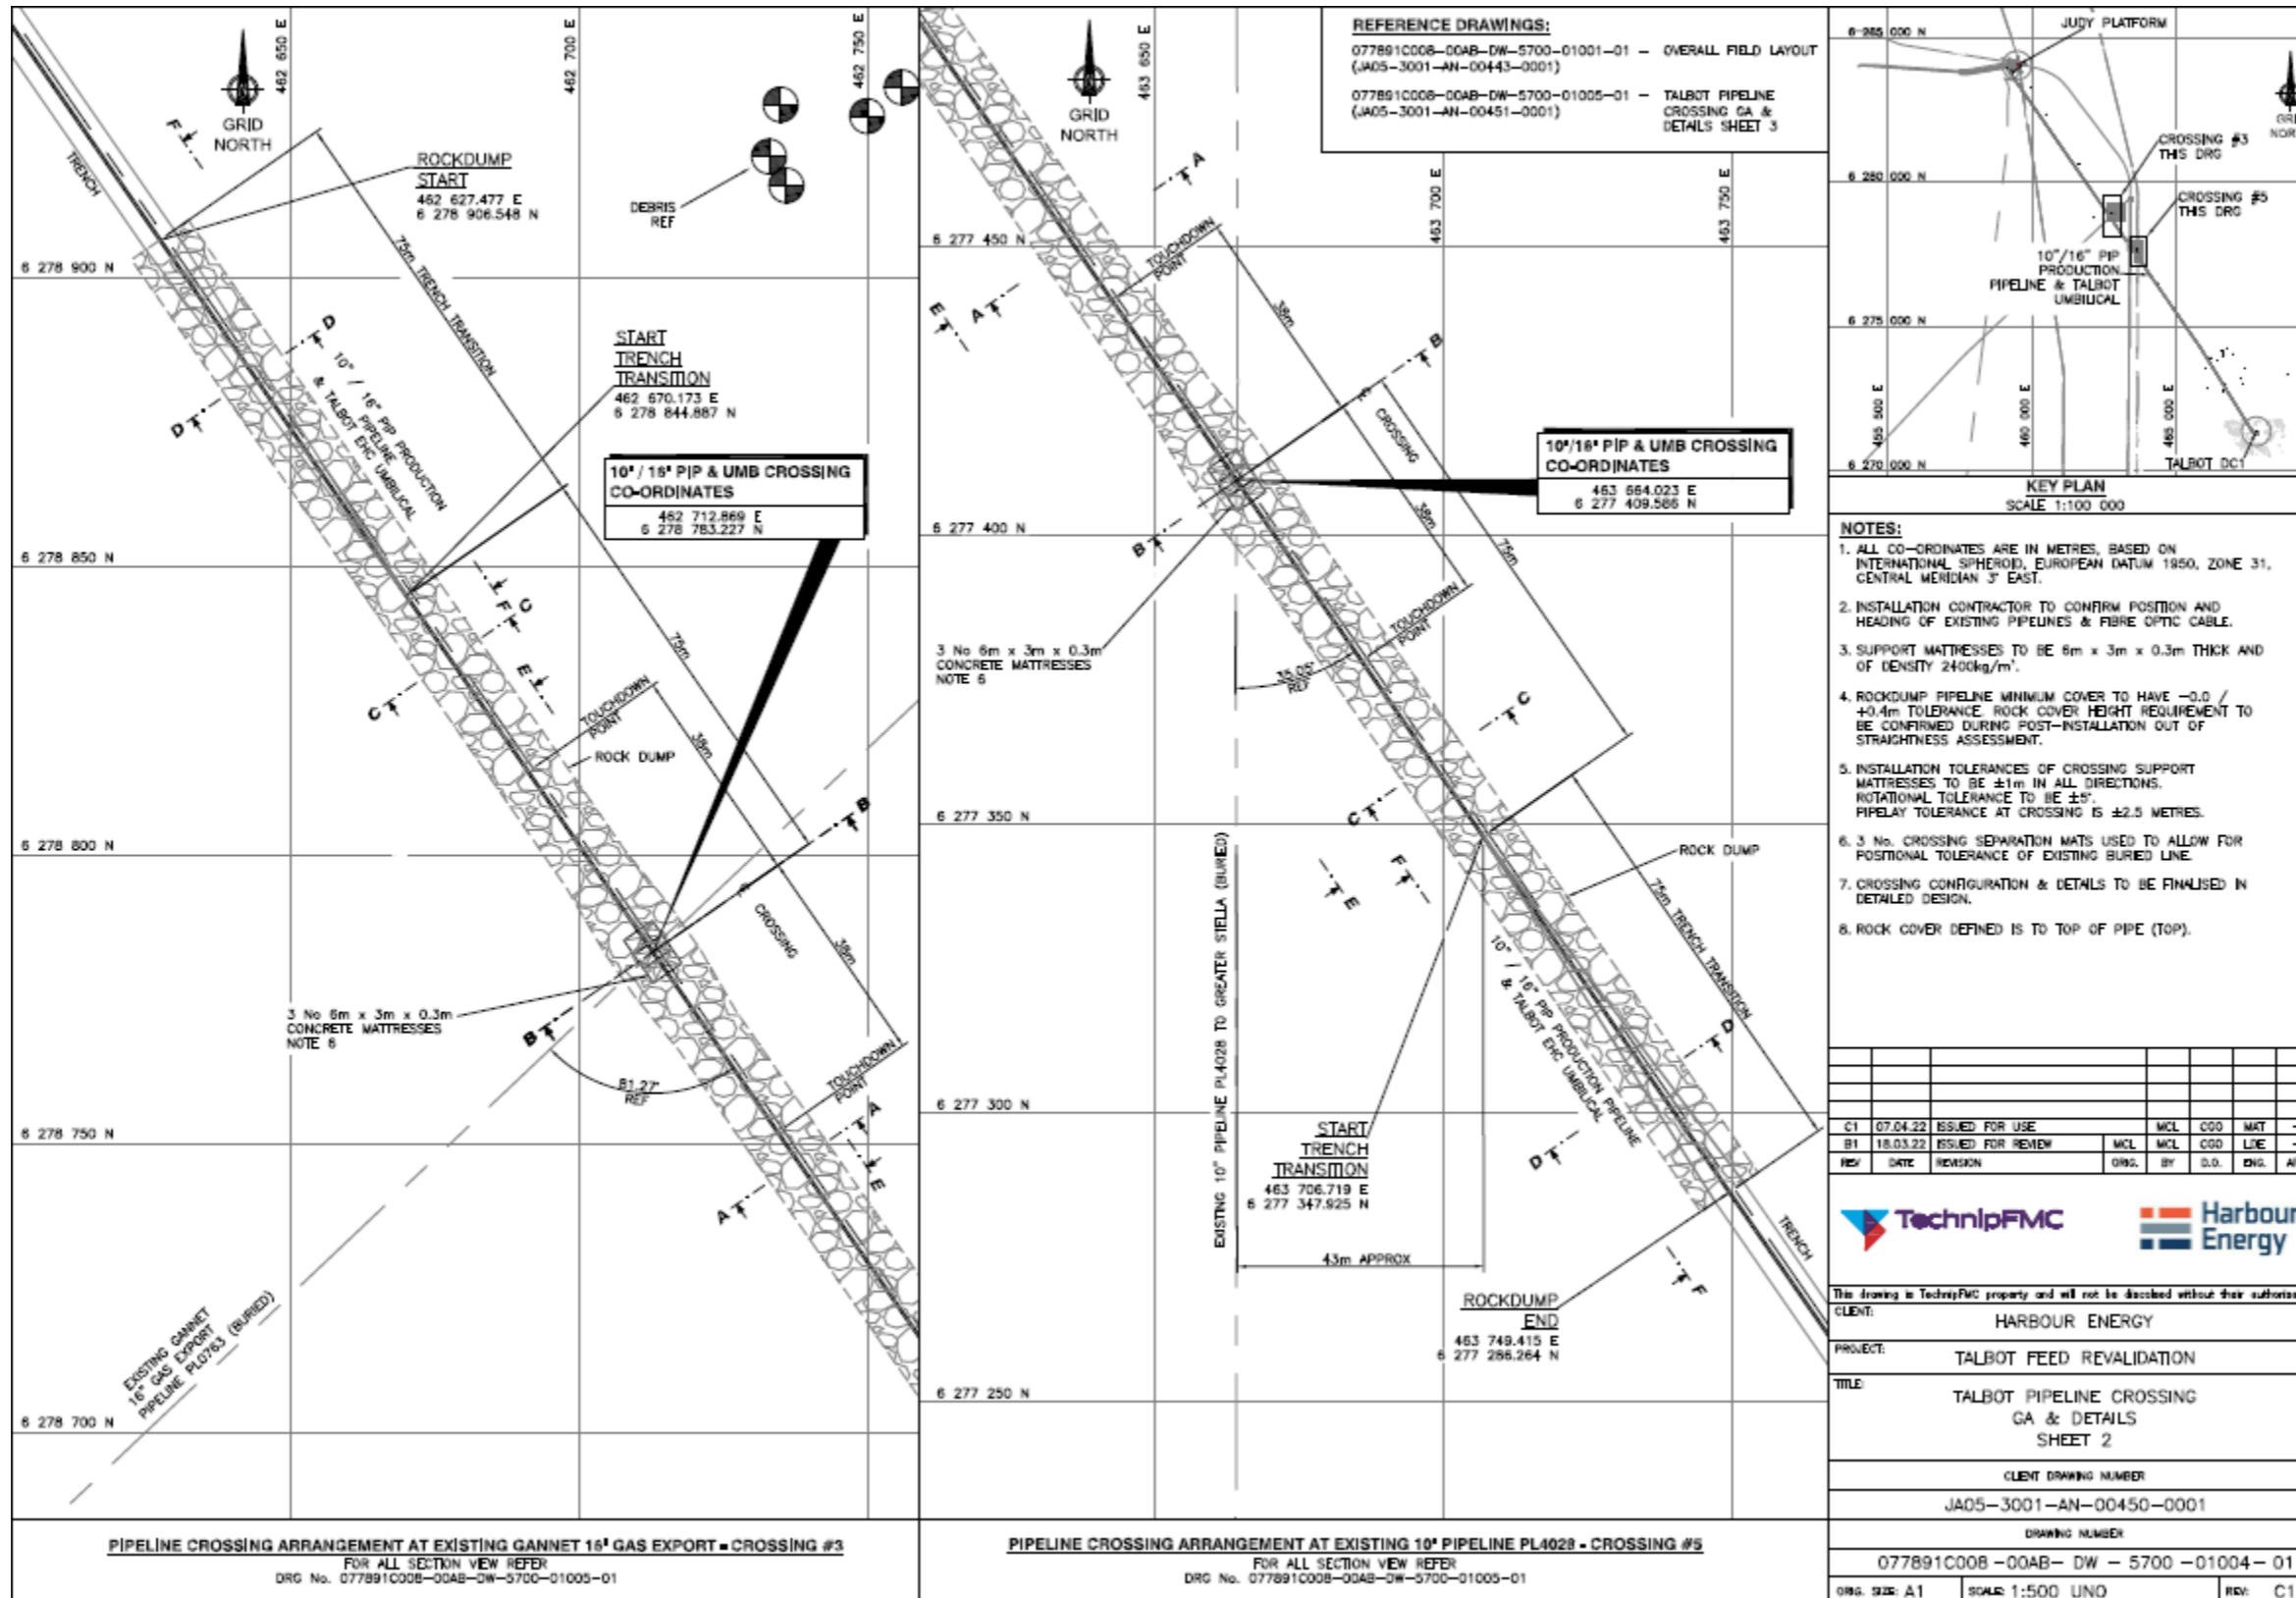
Schematic of Crossing Points 3 and 5 showing location of rock placement and mattress protection
